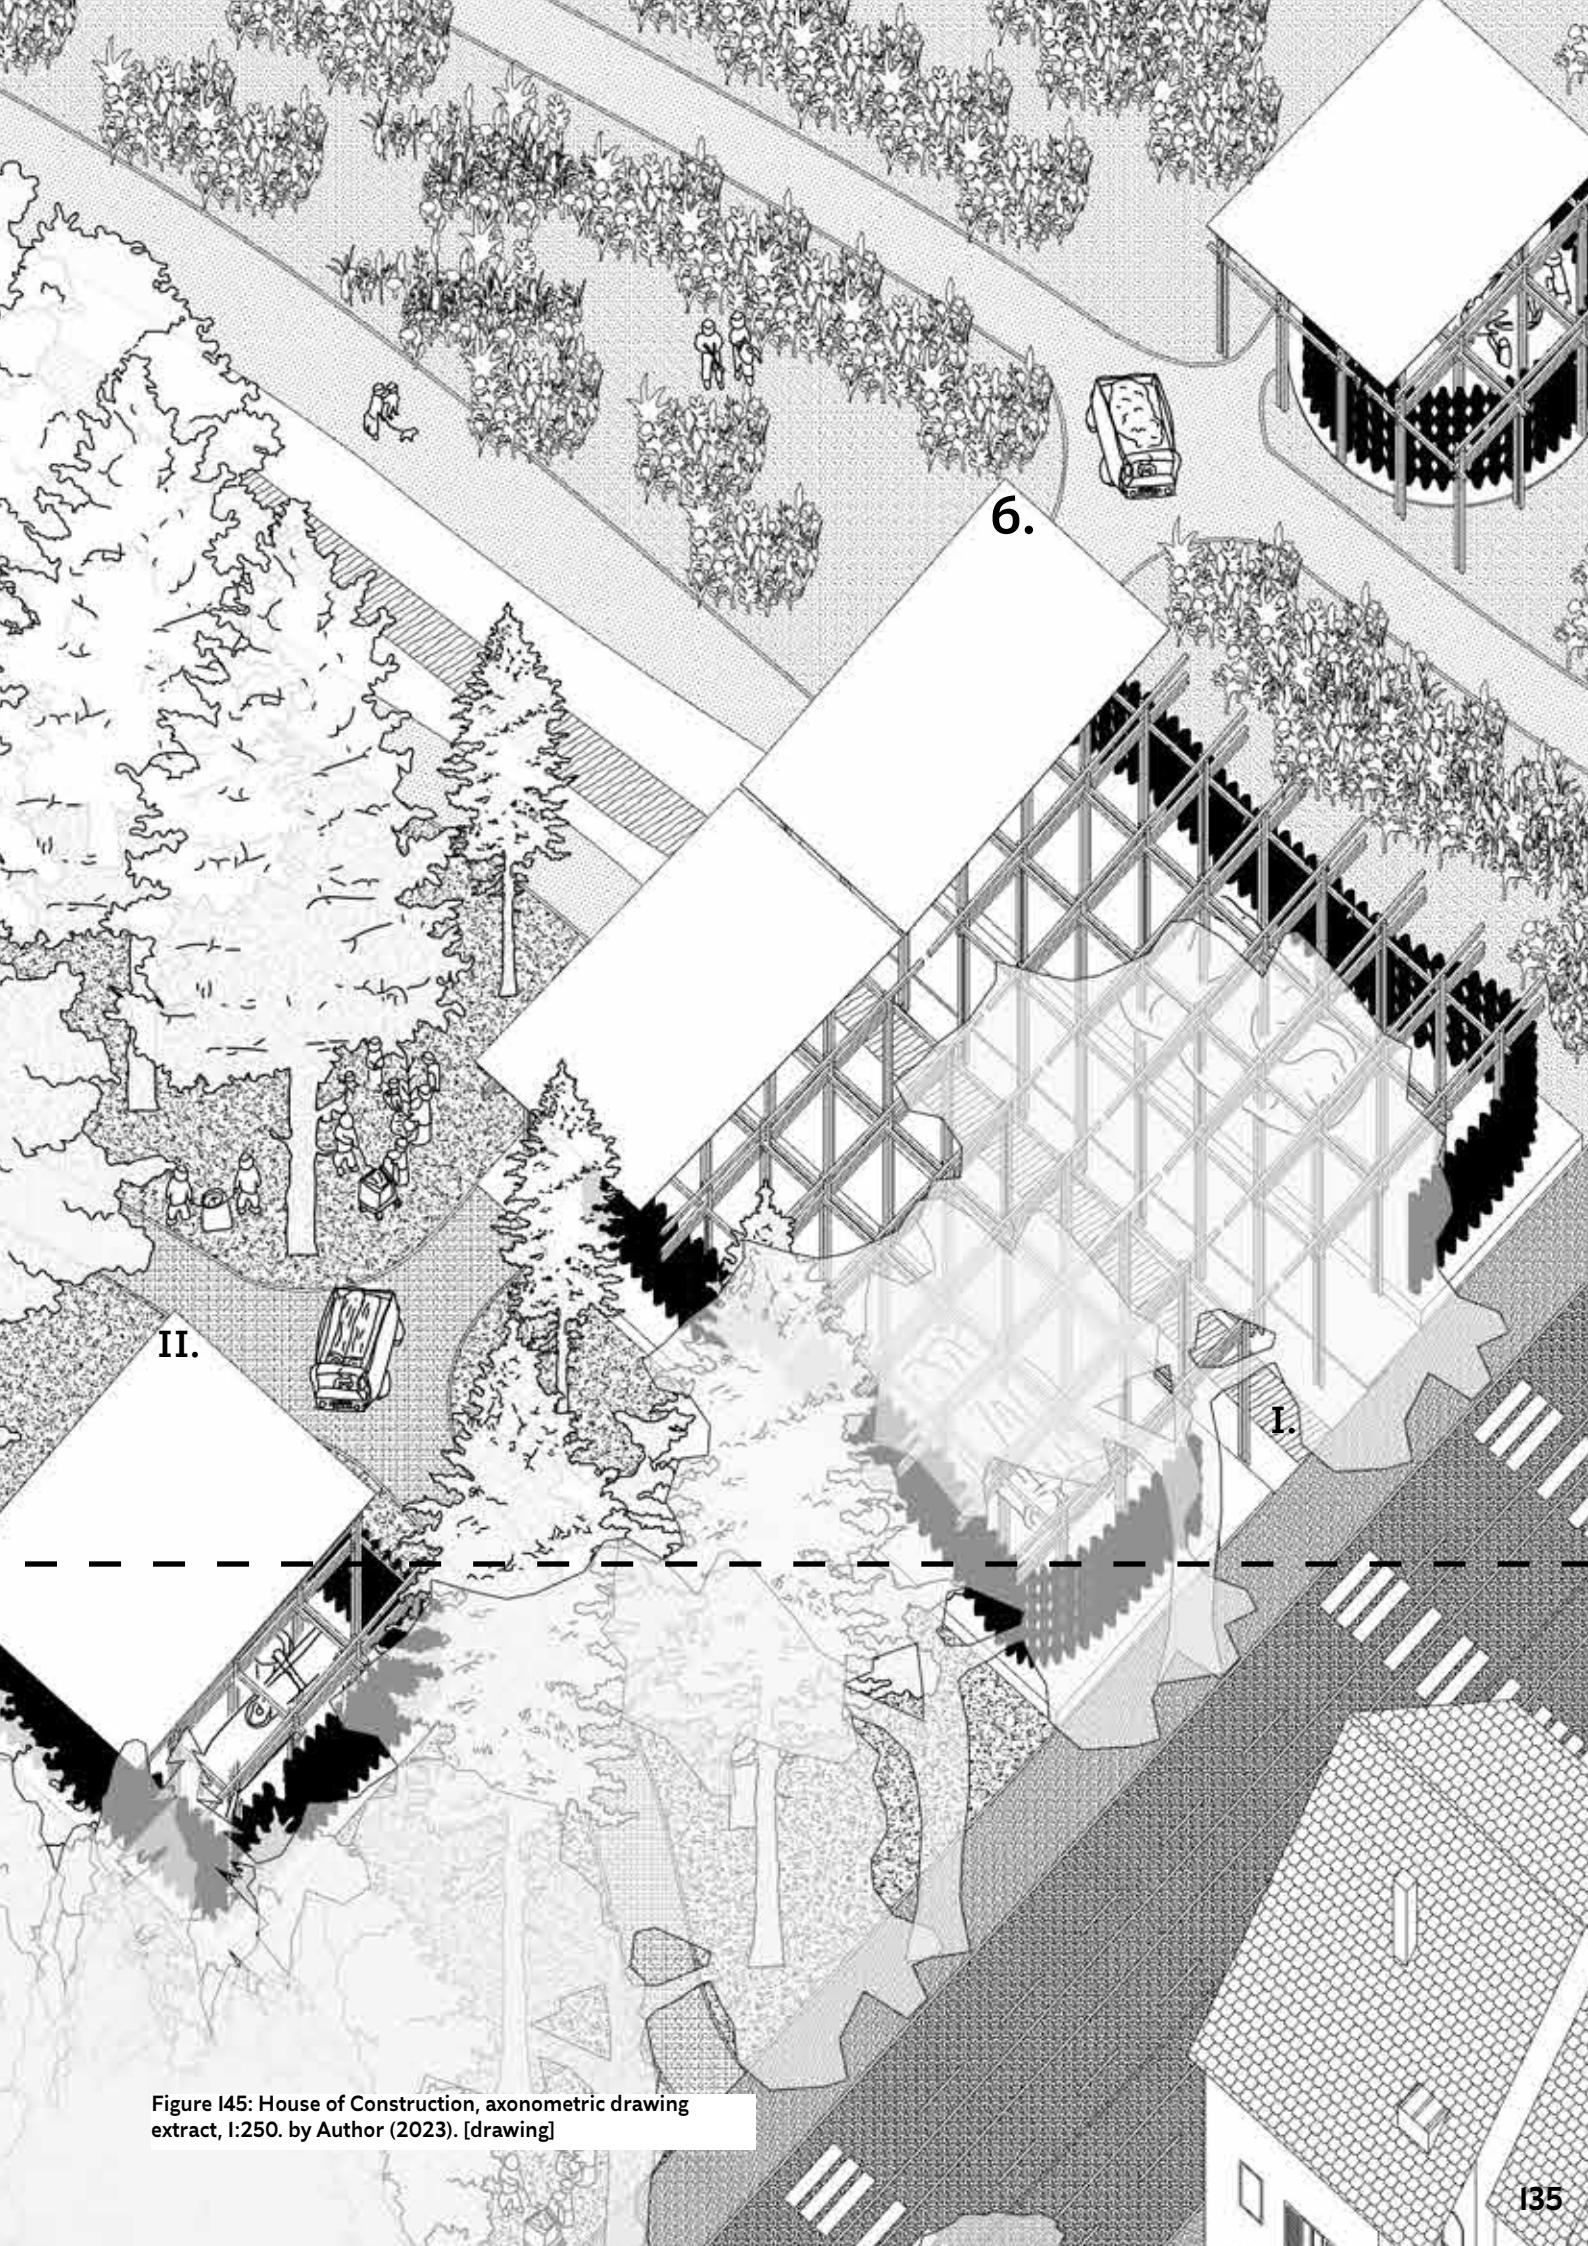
House of Construction, axonometric drawing extract, 1:250. by Author (2023). [drawing]
